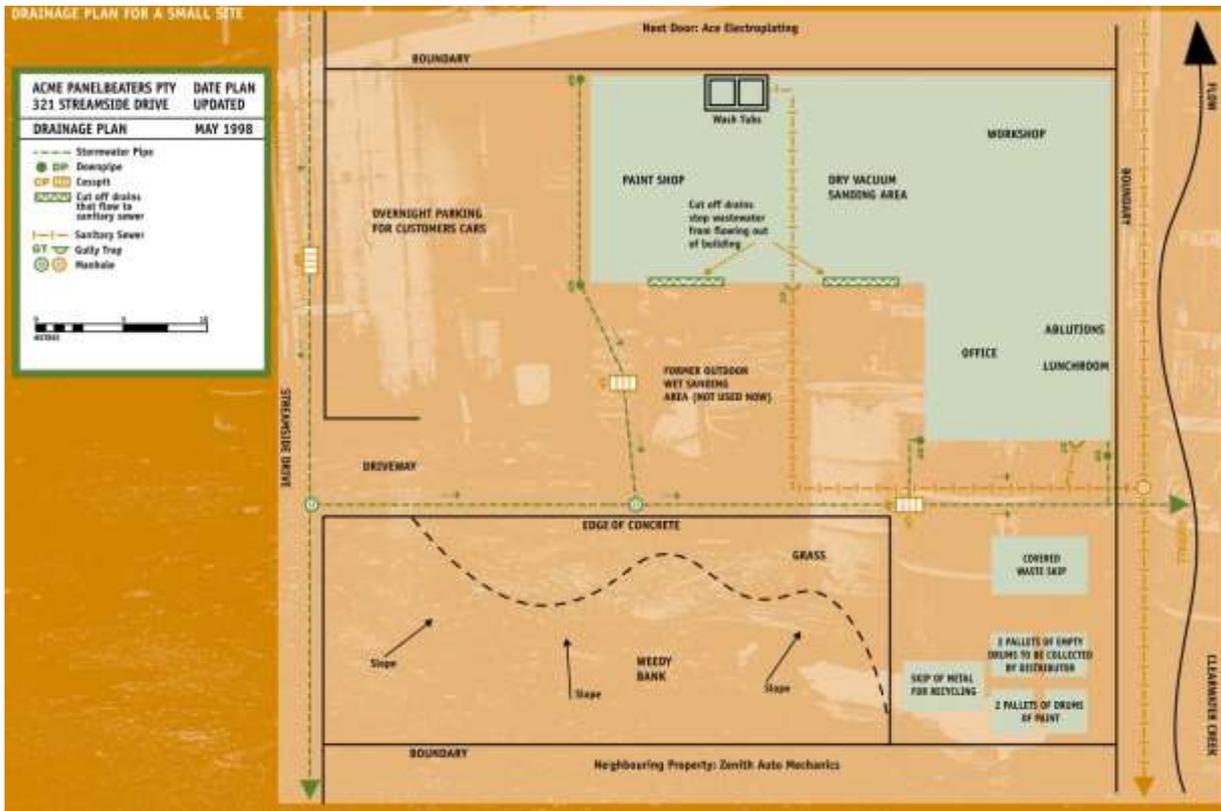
Typical industrial site showing various site elements¹⁵⁹
